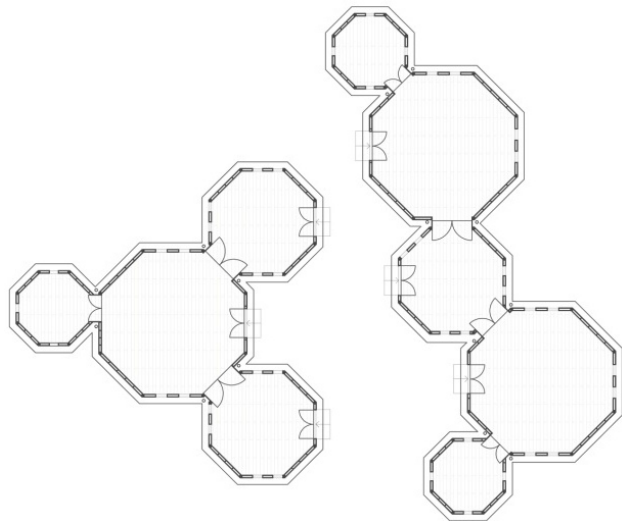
Ground floor plan: intersection of hexagonal shapes
